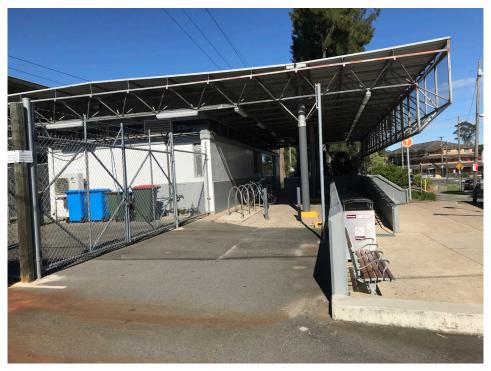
Station entrance looking south from the Park Road commuter car park (Park Road)
